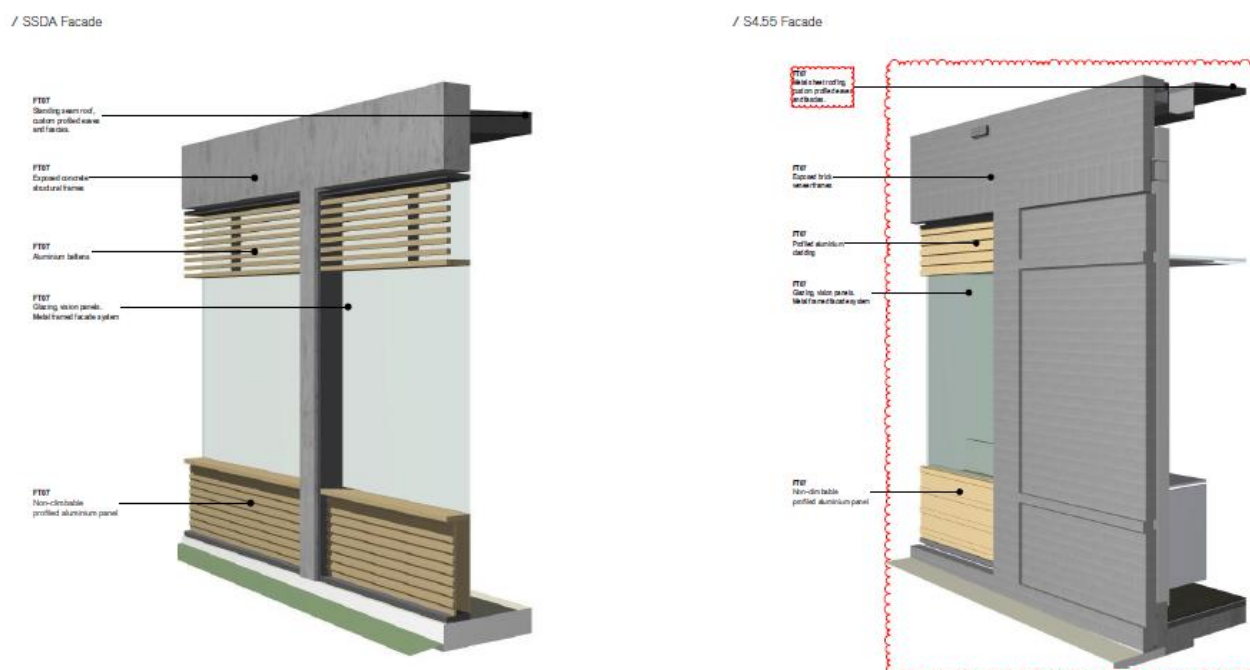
Comparison of approved and proposed materiality of the Building F, G, H and J piers and parapets
